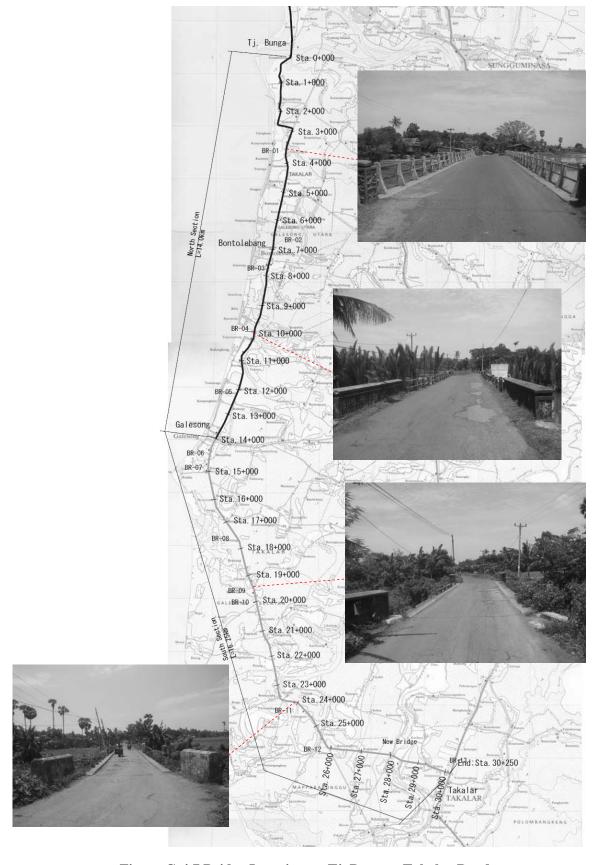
Bridge Location on Tj. Bunga - Takalar Road
